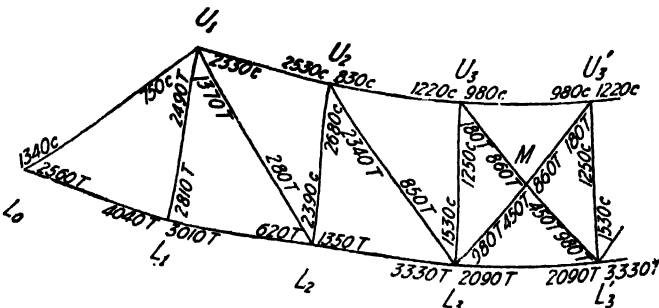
Secondary-stress Diagram of a 201-foot, Single-track-railway, Through, Riveted, Pratt-truss Span.
